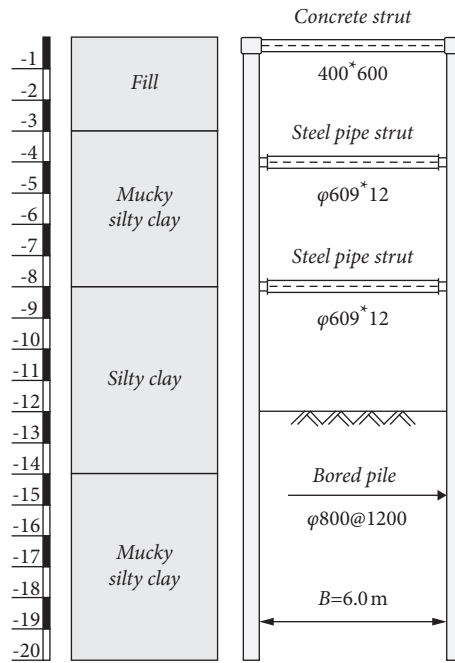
Cross section of the integrated pipe gallery excavation.
